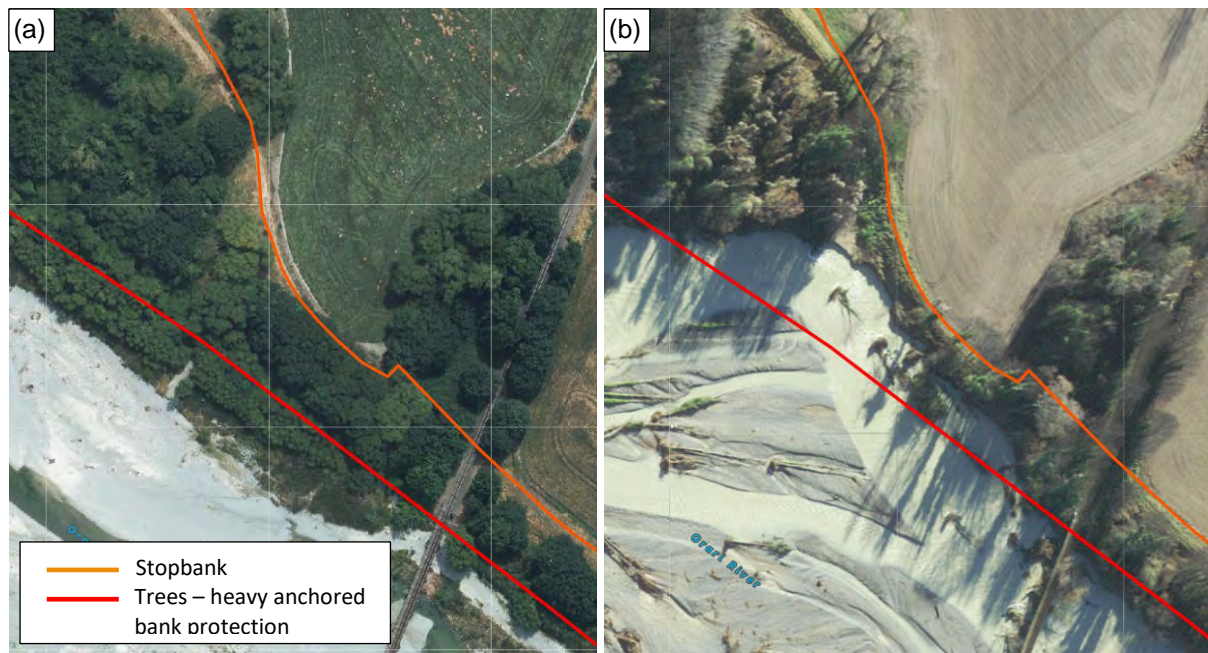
Orari at the railway bridge: (a) Aerial view prior to flood, (b) post-flood aerial showing extend of tree edge protection asset loss and stopbank damage.
